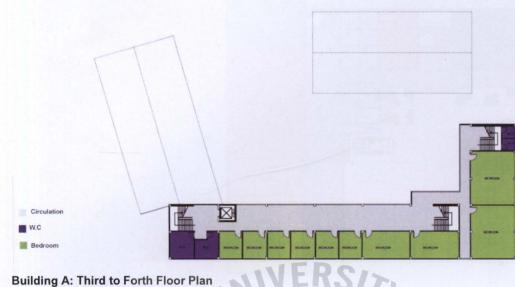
FLOOR PLANS OF BUILDING A: PATTAYA REDEMPTORIST SCHOOL FOR THE BLIND
